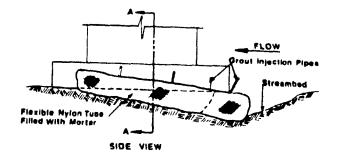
CONCRETE JACKETING AND RIPRAP<sup>20</sup>
